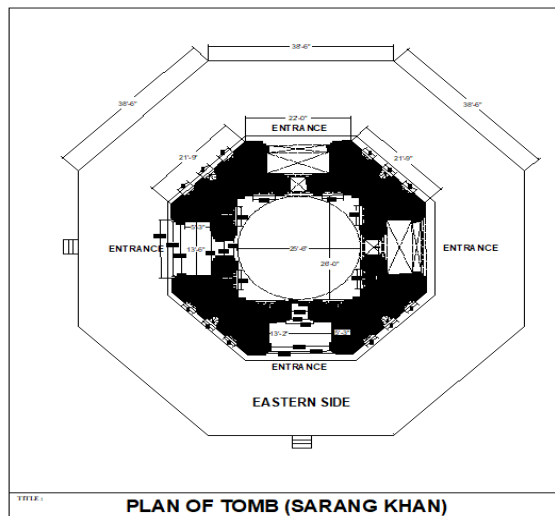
Plan of Mausoleum Sarang Khan (Before Excavations).
